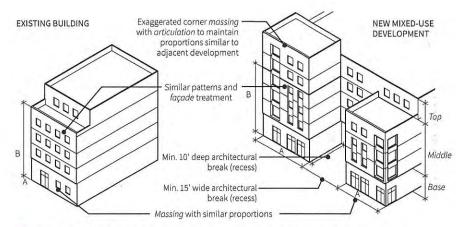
Design the street façade to be proportional to the form and scale of surrounding developments.
